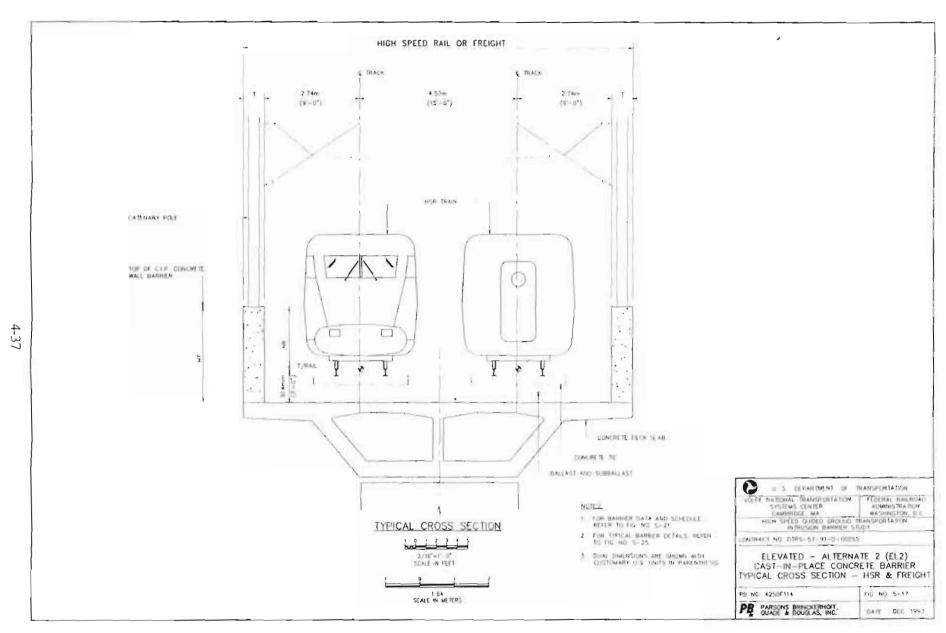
ELEVATED ALTERNATE 2: C.I.P. CONCRETE WALL - TRANSVERSE SECTION/RR
